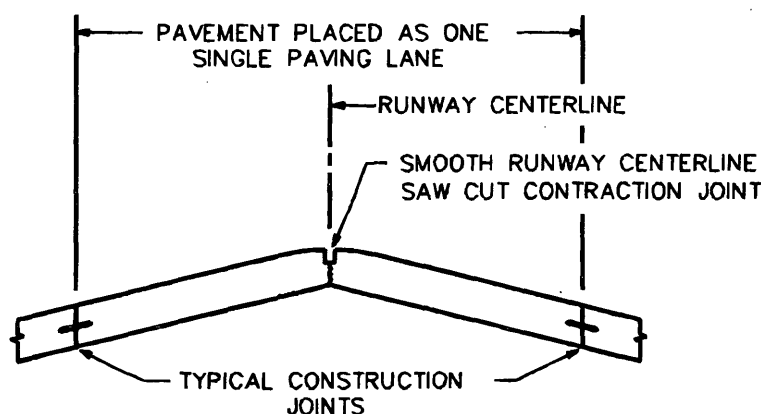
Smooth centerline joint constructed as internal saw cut contraction joint.
